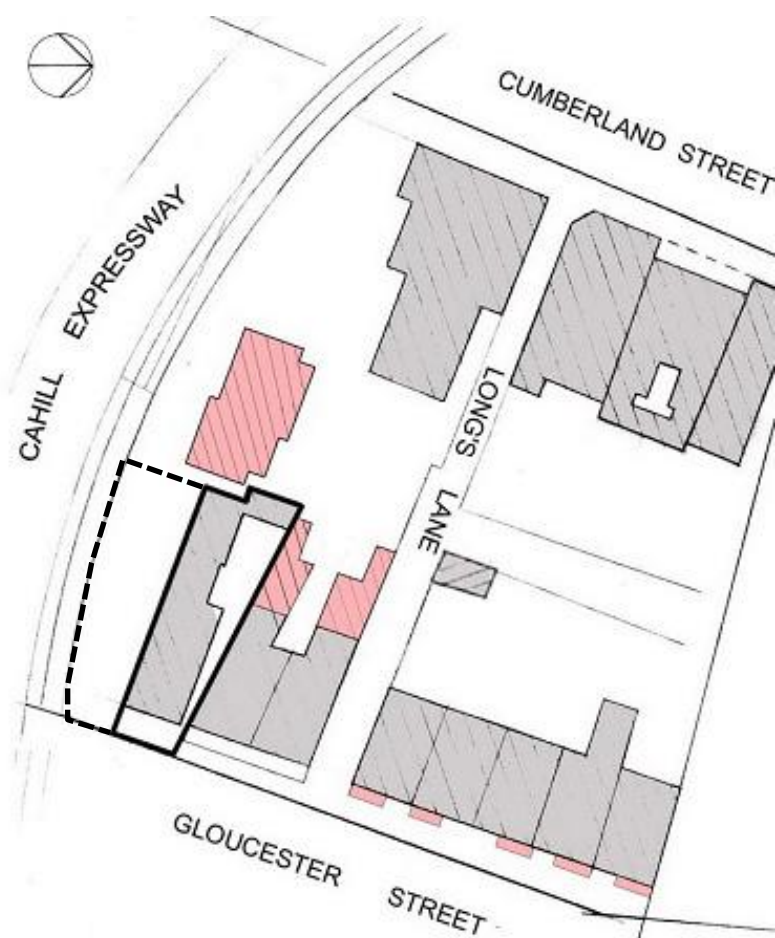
2007. New infill housing was constructed in 1996 to the southwest of the subject site, with access to Gloucester Street via the curtilage to the subject site.
